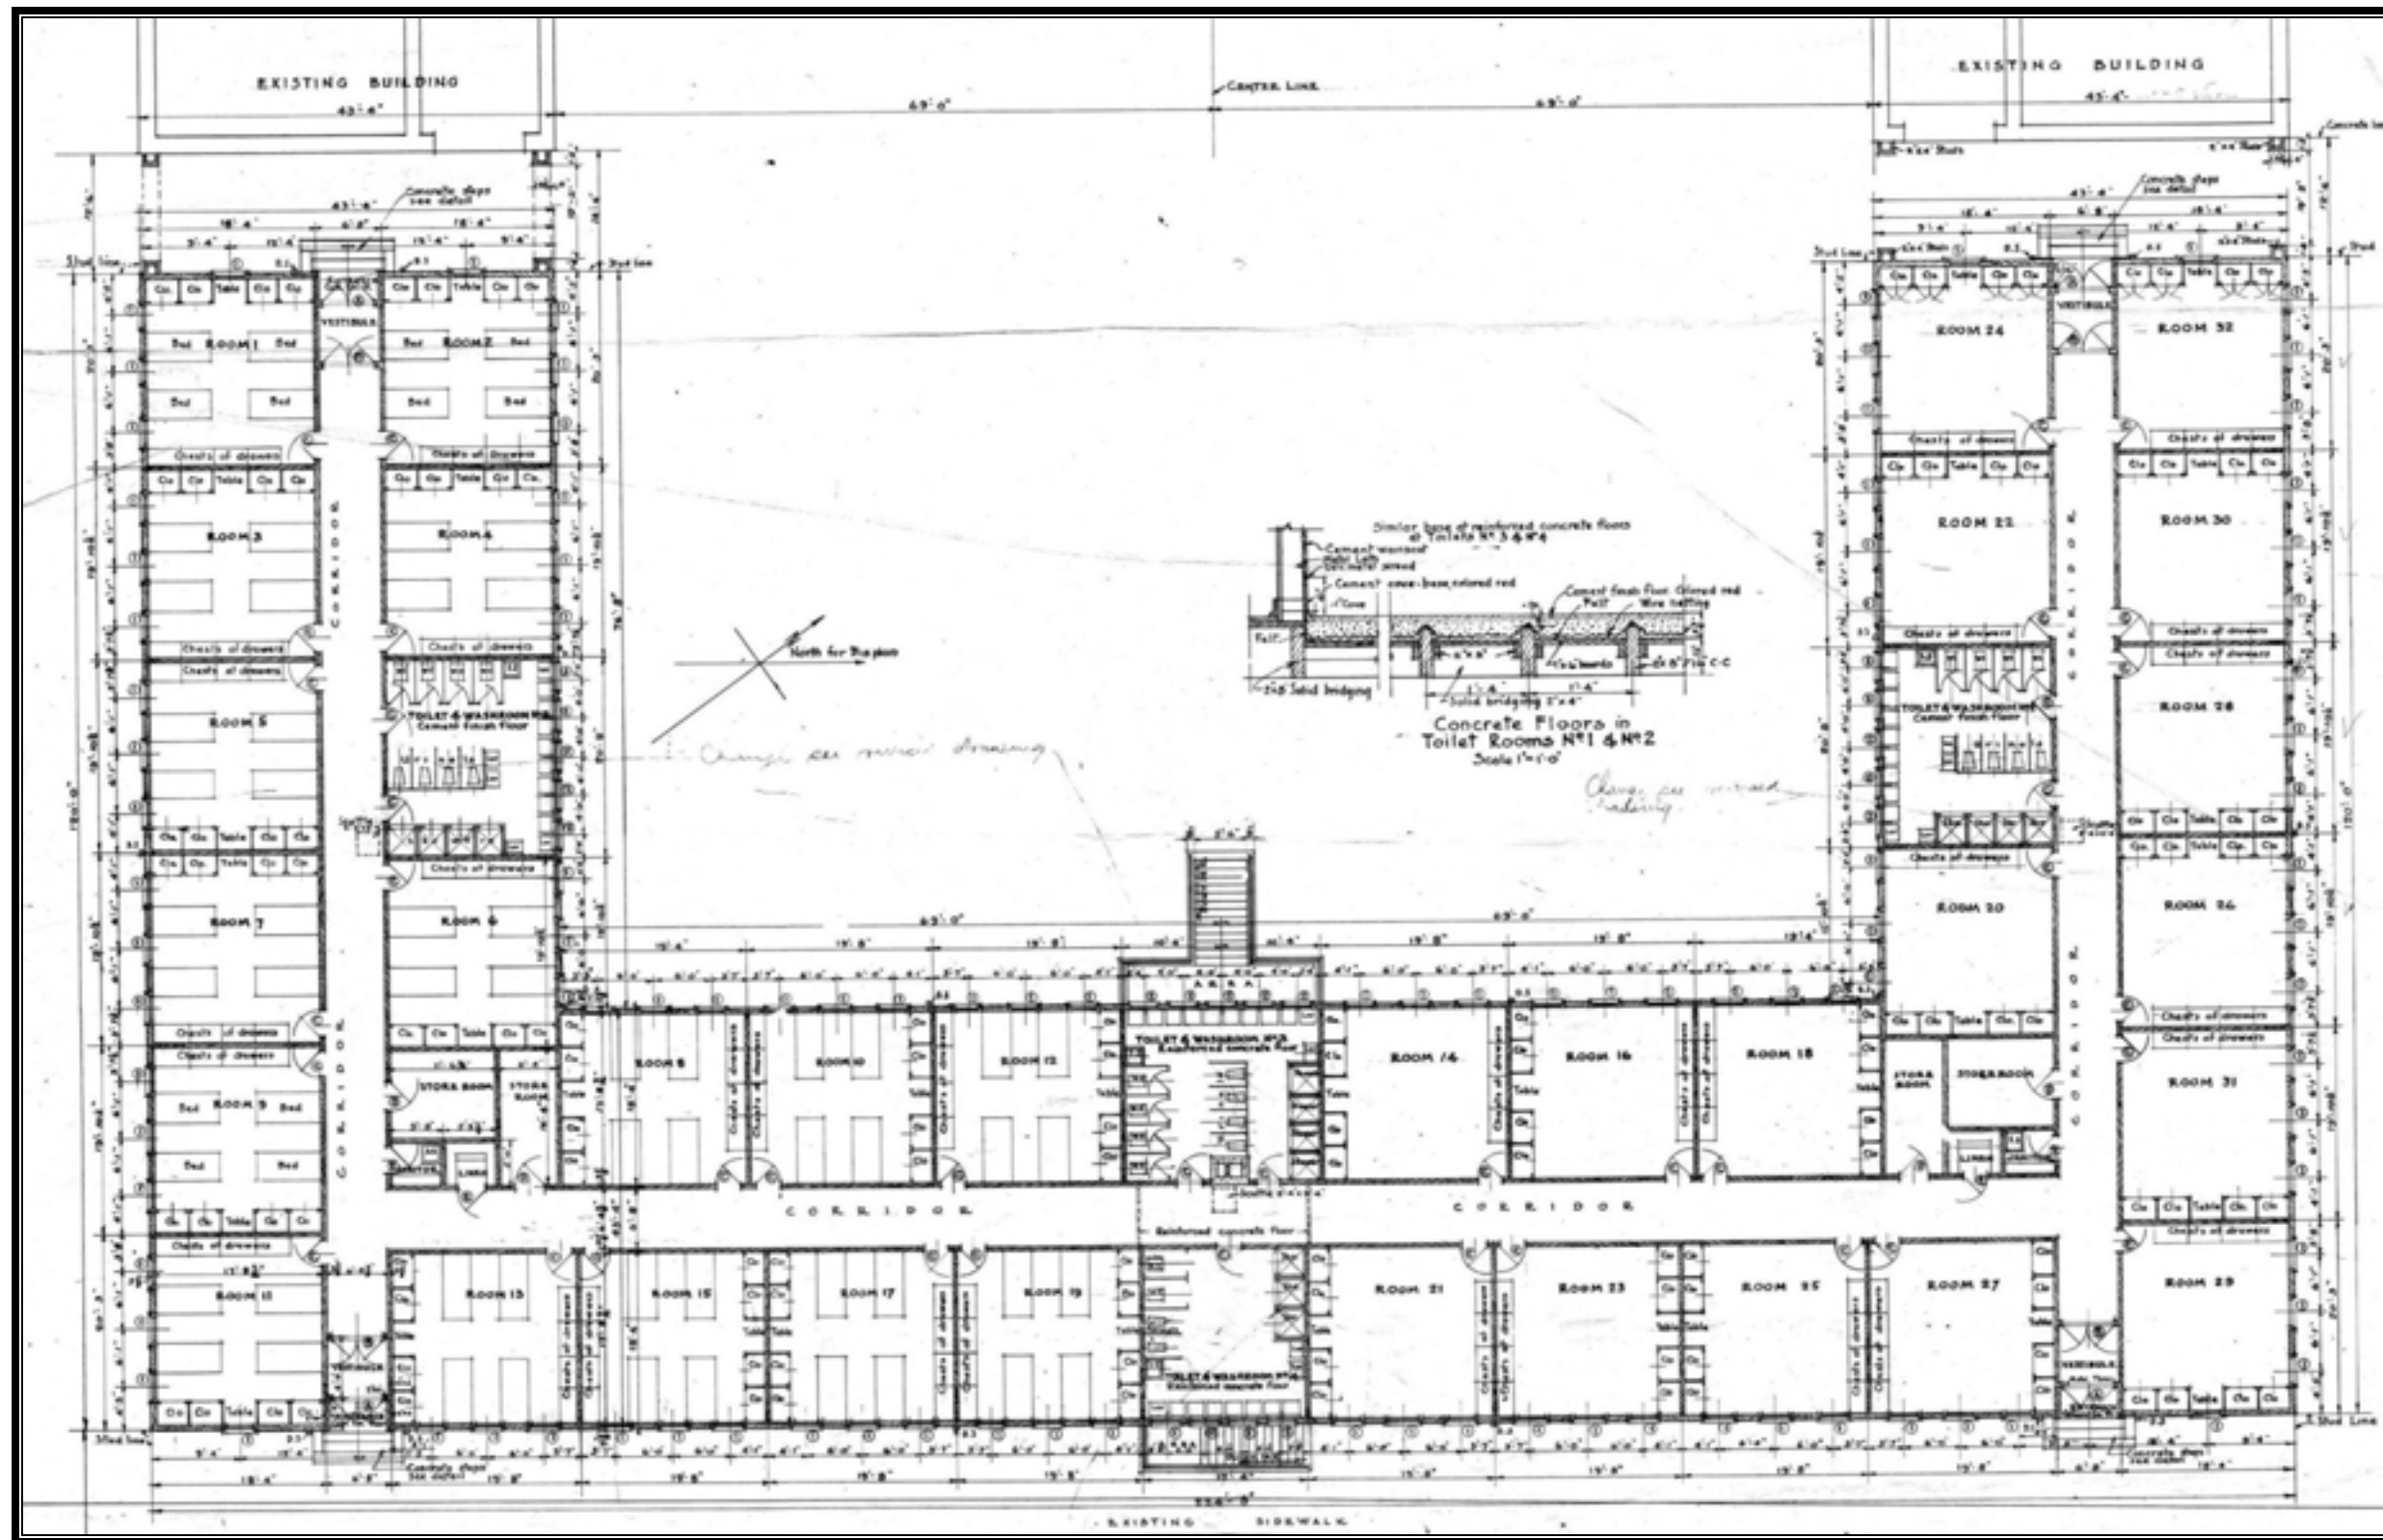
Building I extension, 1937 (Courtesy Naval Air Station North Island)
